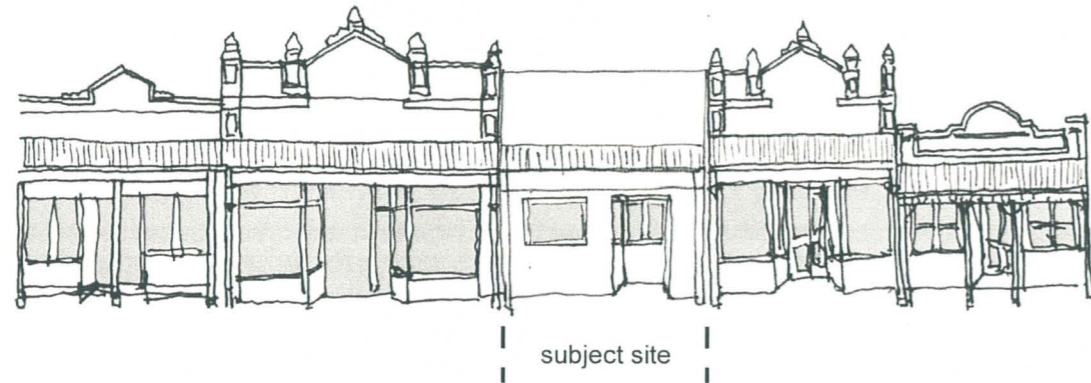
A bad example of infill where blank walls dominate the street facade. The streetscape patterning of the adjacent heritage buildings has not been appropriately considered.
